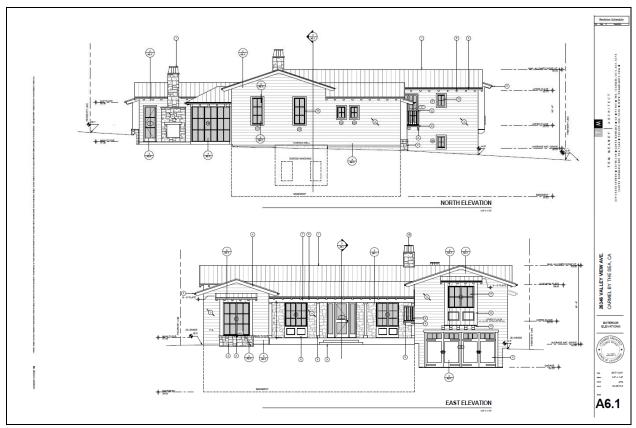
Elevations: Proposed Elevations 26338 Valley View Avenue (north and east exterior elevations).
